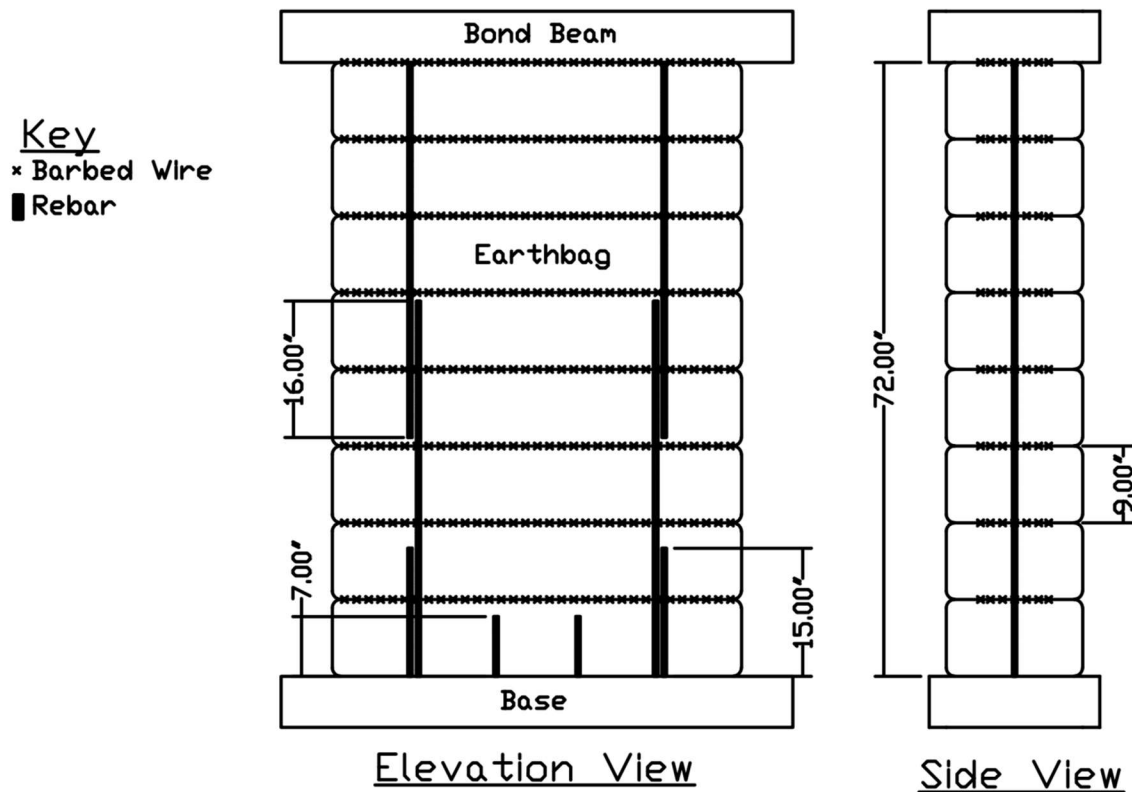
Front & Side View of Wall Showing Rebar Placement & Barbed Wire.
